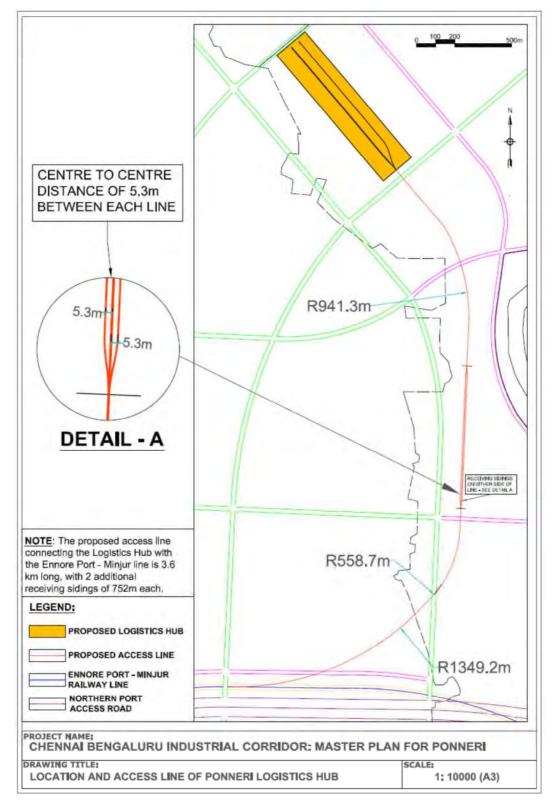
Ponneri Node – Layout of proposed rail access line and reception sidings
